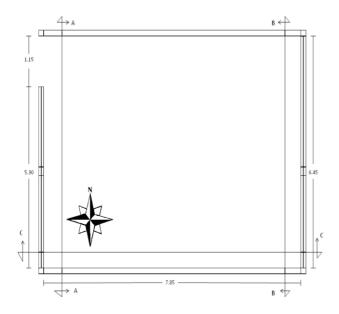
Floor plan of the academic classroom (in metres) *Source: Own elaboration
